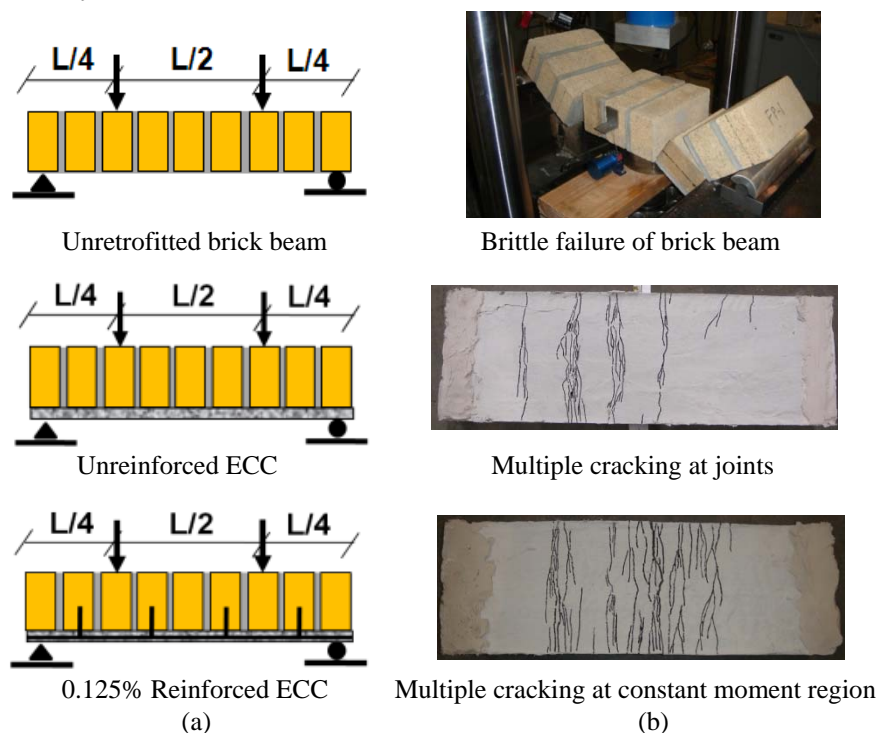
(a) Load application and (b) cracking response of 4-point bend specimens with no retrofit (top), unreinforced ECC (center) and with ECC reinforced with 0.125% by area steel and attached to anchors (“Stitch dowels”) grouted into the masonry (bottom).
